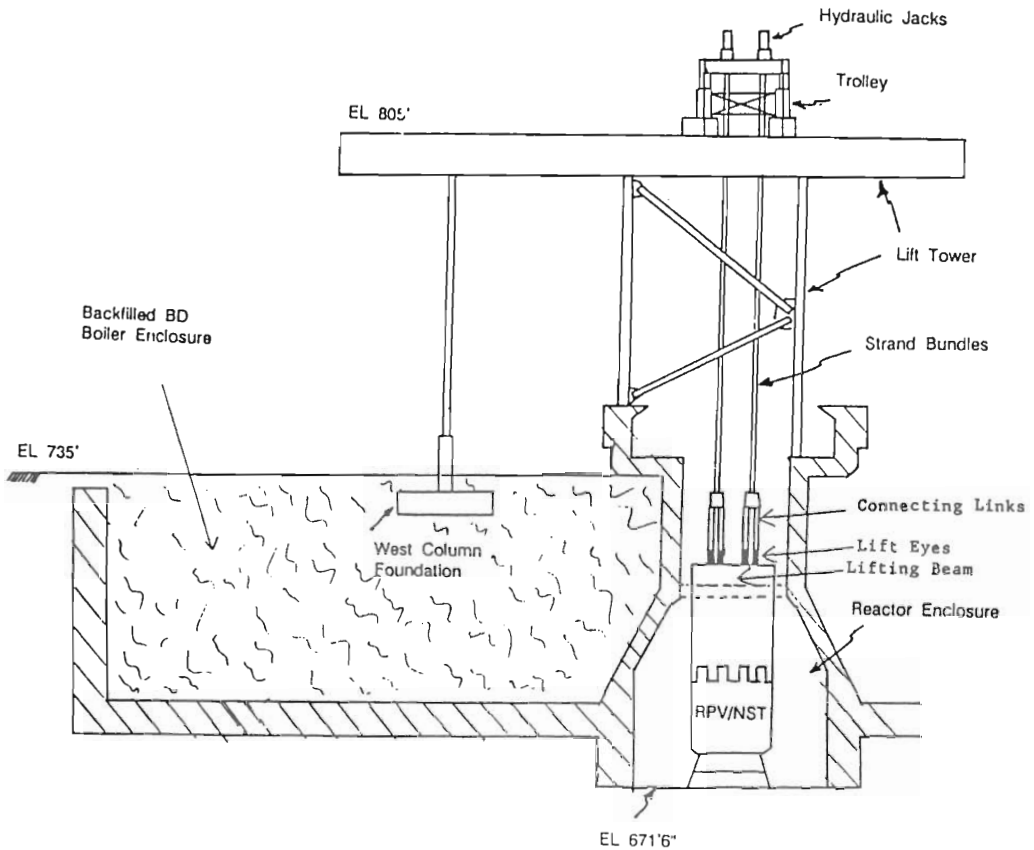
Section View of Lift Tower Looking North (Ref. DOE/SSDP-0079)
